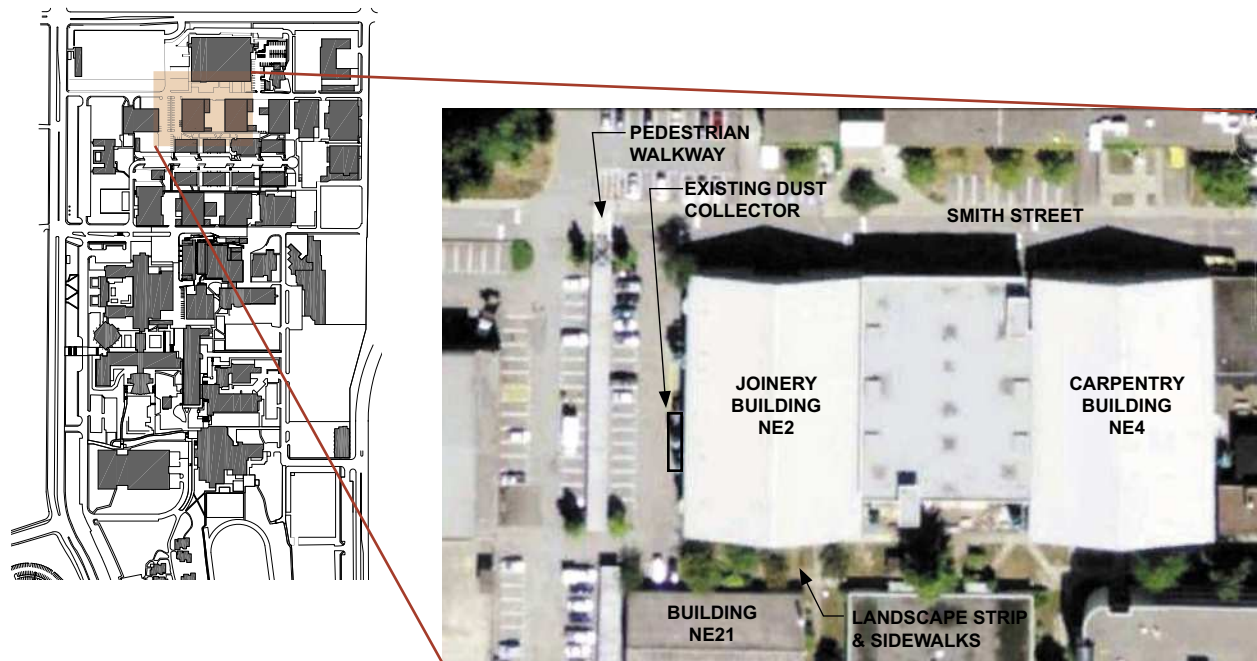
BCIT Burnaby Campus partial site plan and location plan
